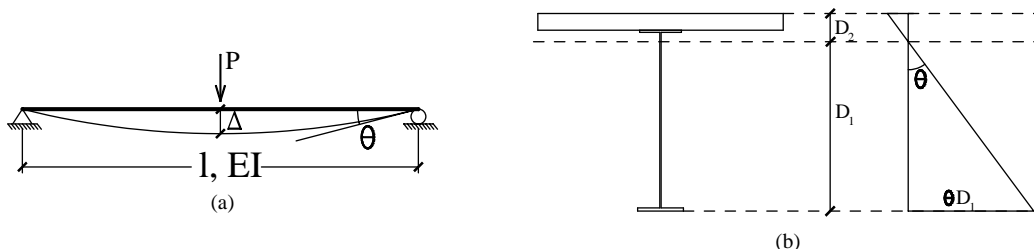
(a) A simply supported girder with a concentrated force at midspan and (b) bridge girder section under bending moment.
